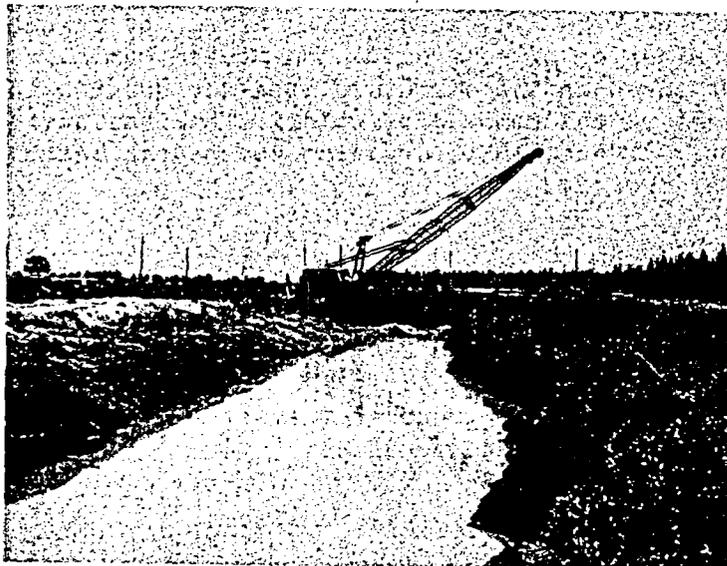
CANAL EXCAVATION AND SPOIL HANDLING
